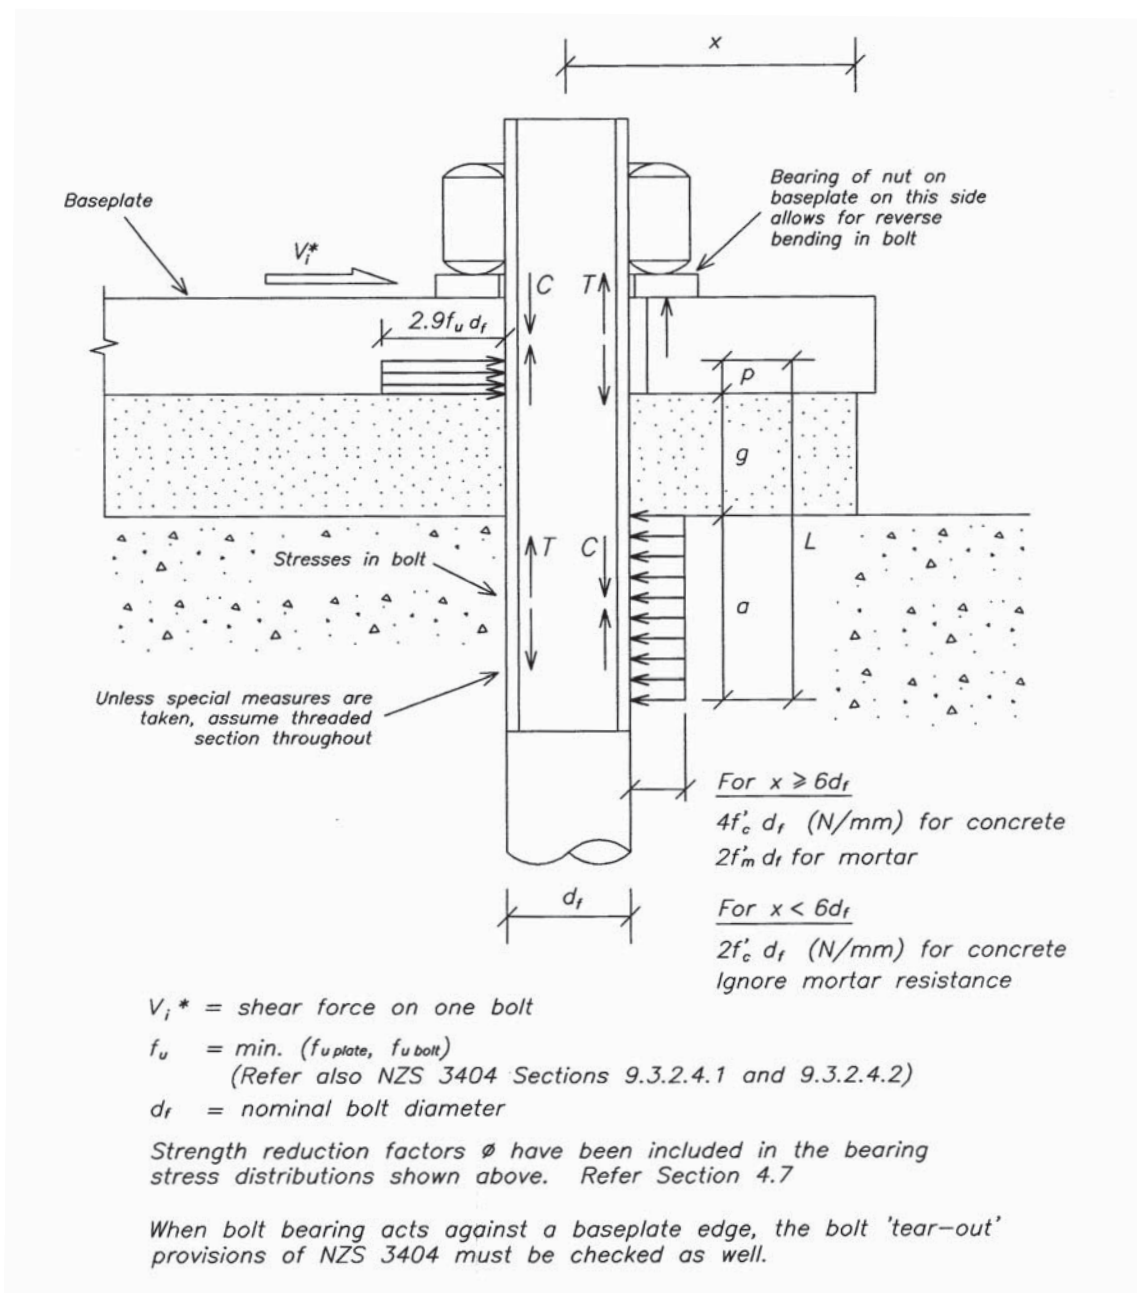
Detail of Bolt Bearing on Baseplate and Concrete, and Bolt Bending
